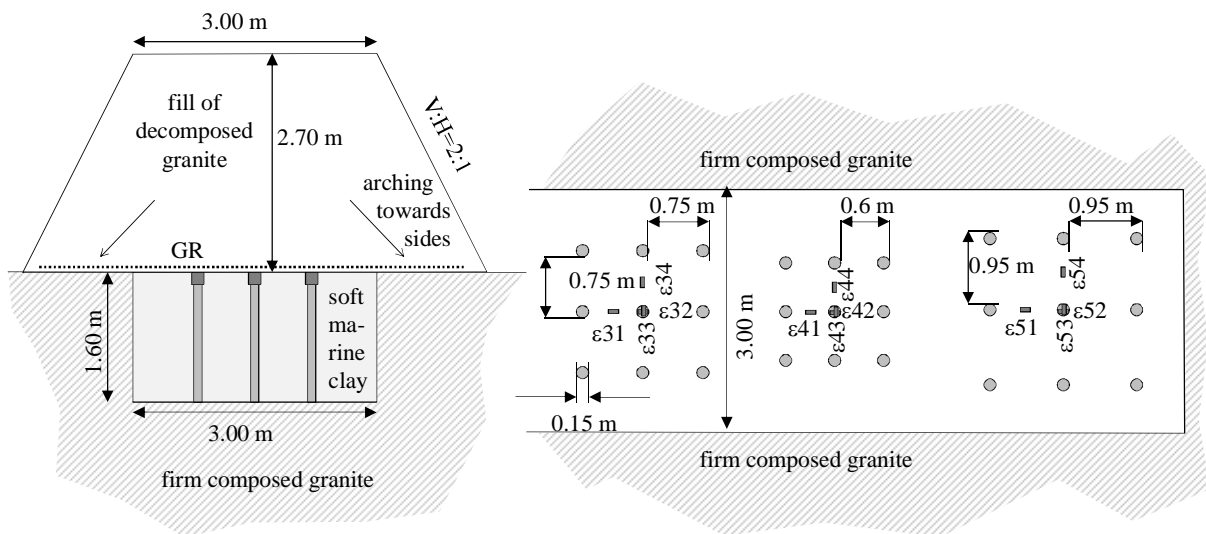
Layout of the three test fields with piles and GR. Drawing modified after Oh and Shin (2007).
